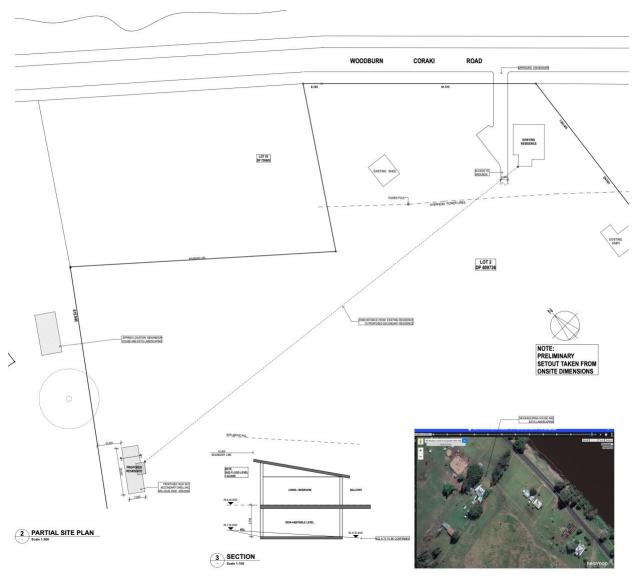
Site plan of proposed dwelling (source: RSA Architects SK-0001-C)
